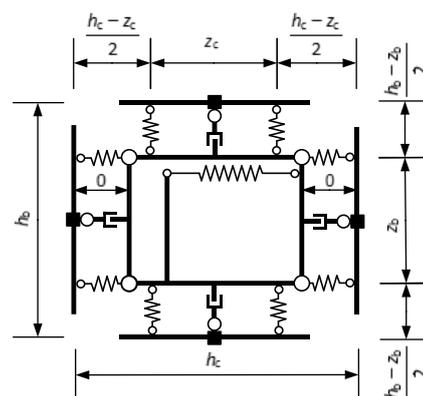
Beam-to-column joint model proposed by Costa (2013).
